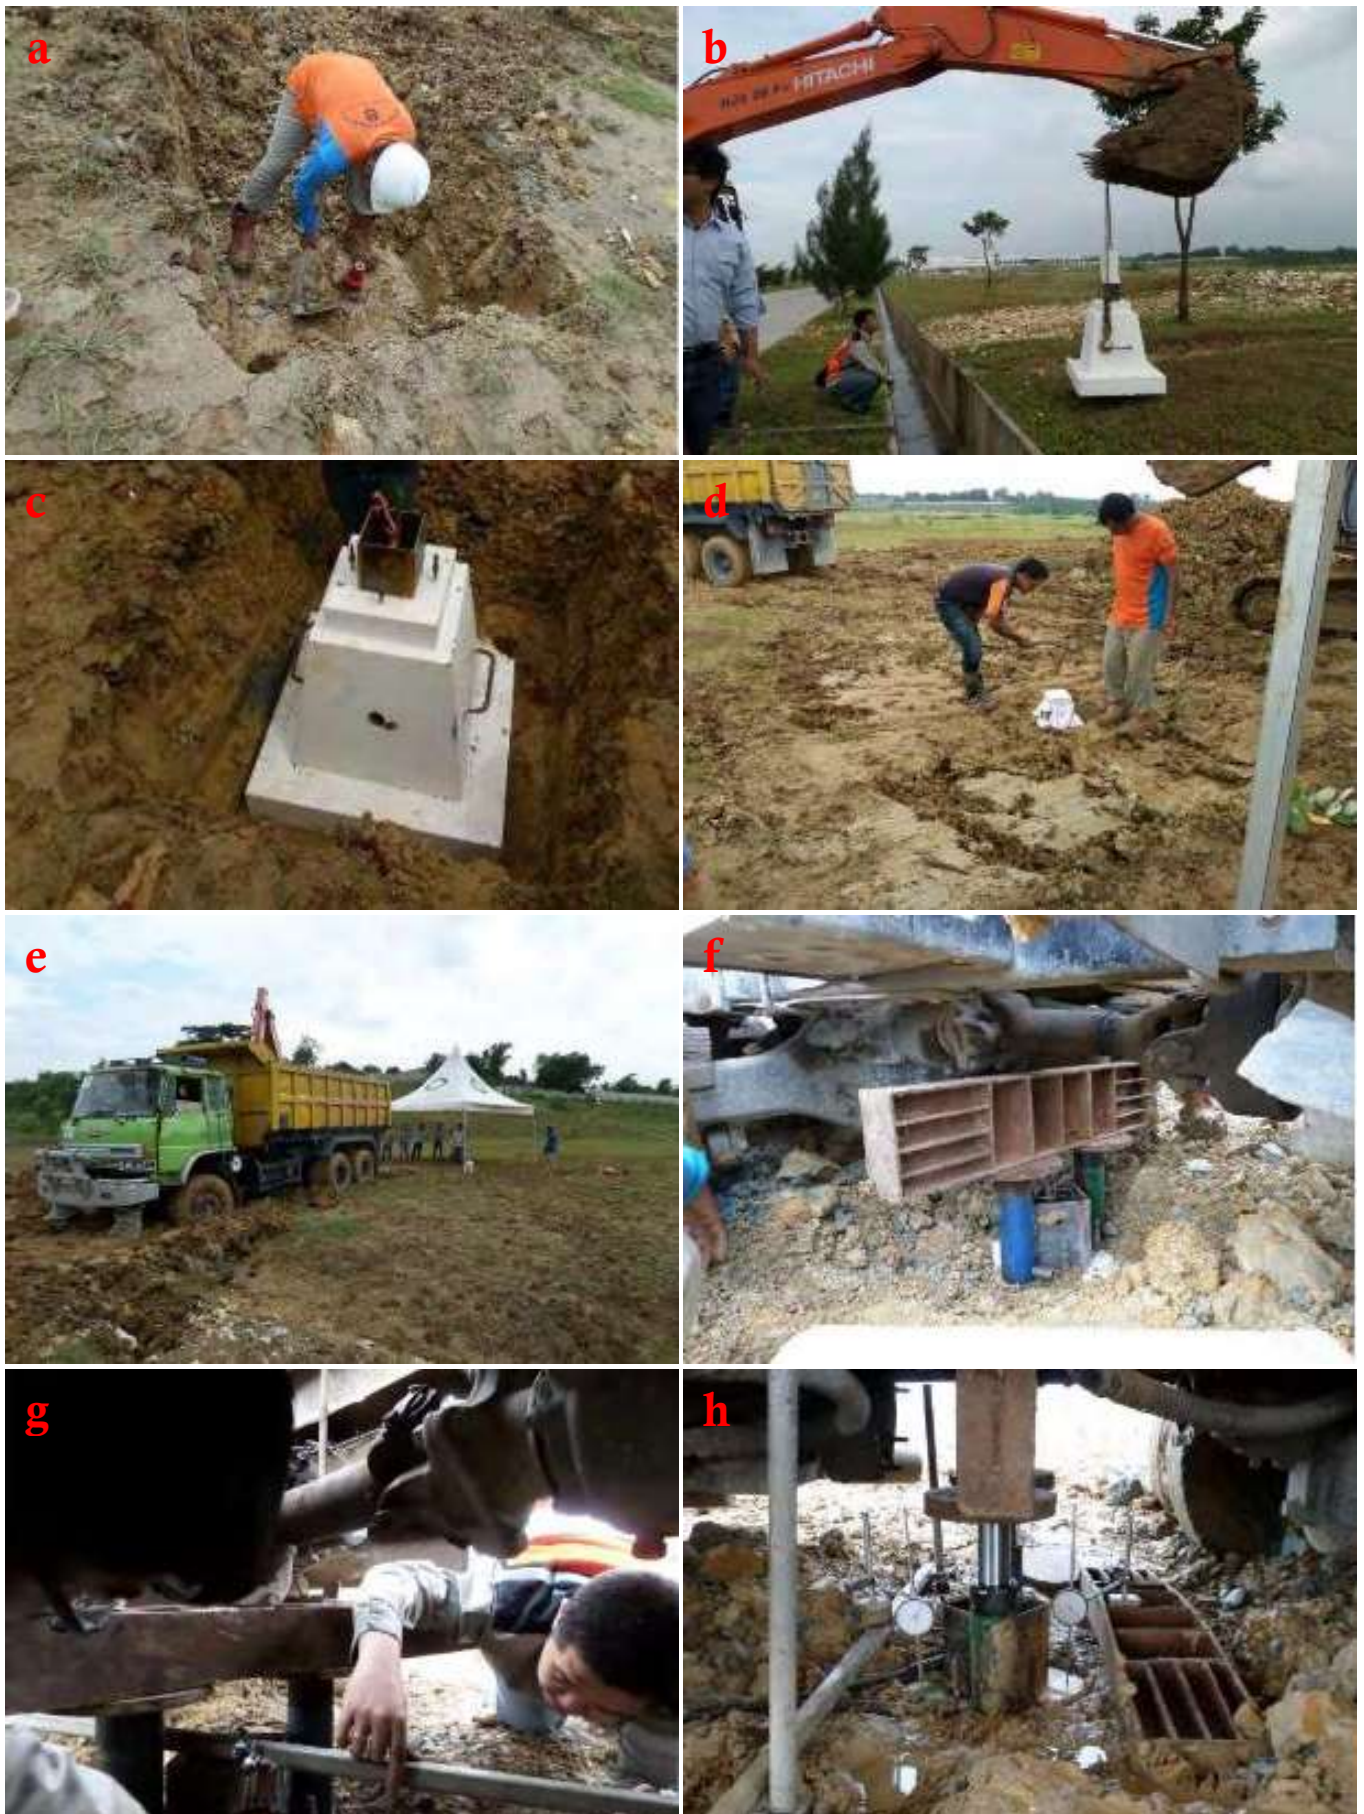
Process of conducting full-scale load test: a) initial excavation, b) lifting foundation model, c) placing foundation on excavation base, d) backfilling the pit, e) setting up the reaction system, f) configuring main beam as frame, g) setting dial gauges and beams and h) load test execution
